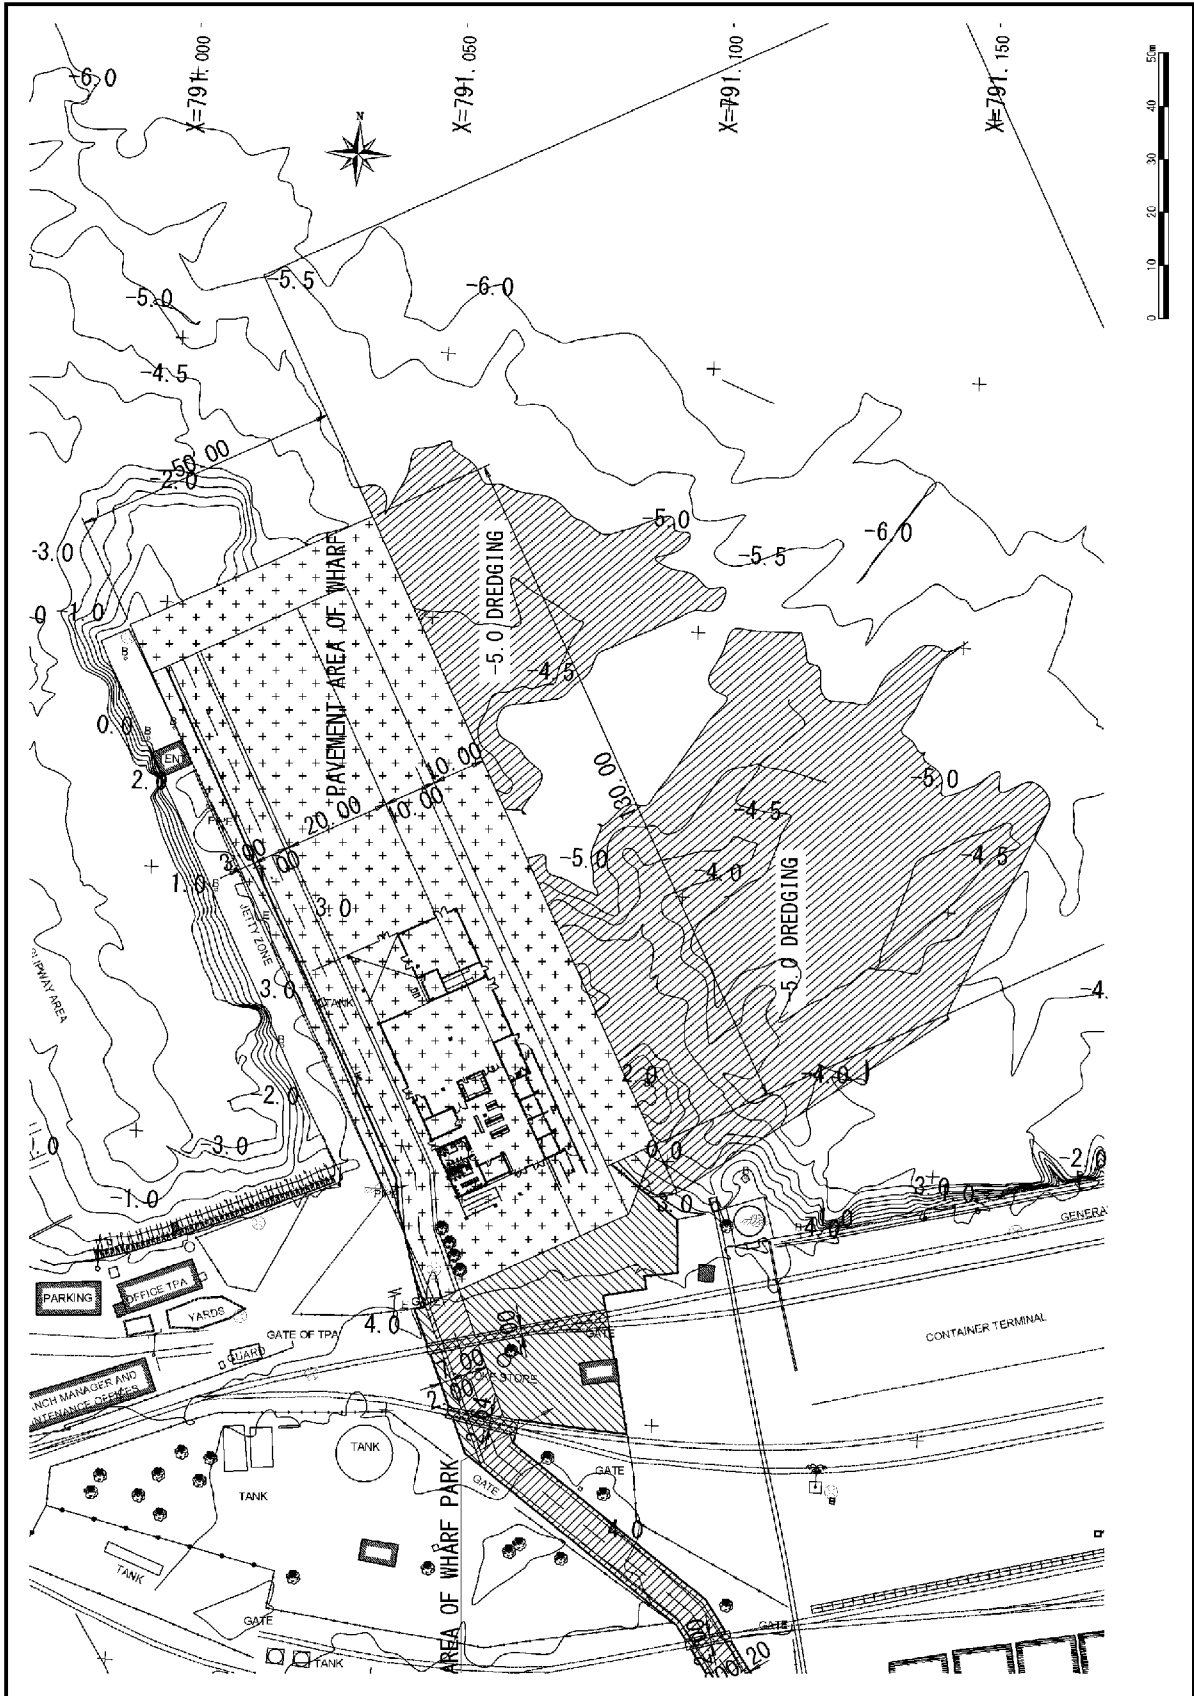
Detail Layout Plan of Passenger Wharf
